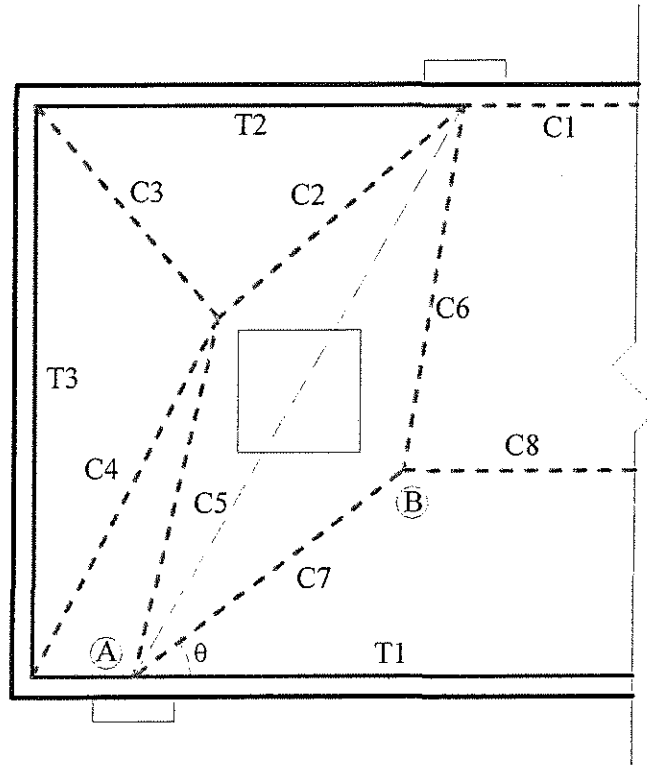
Common strut-and-tie model for beams without reinforcement.
